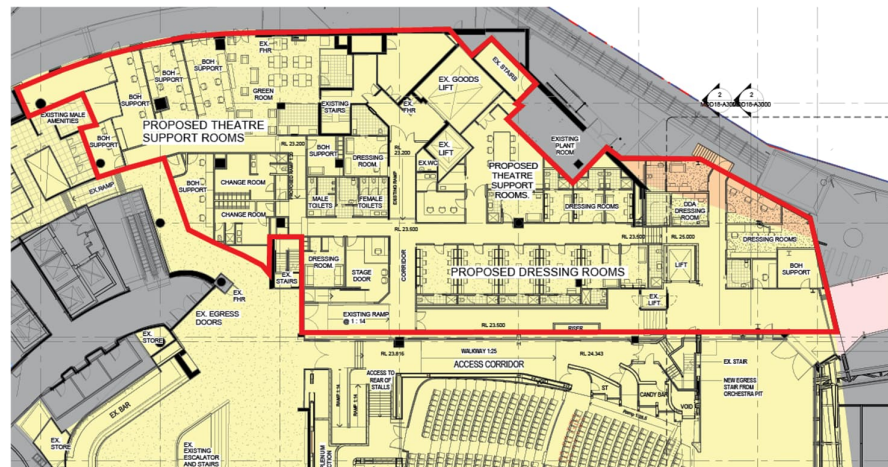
Level 03 dressing rooms and support rooms for the Broadway Theatre
